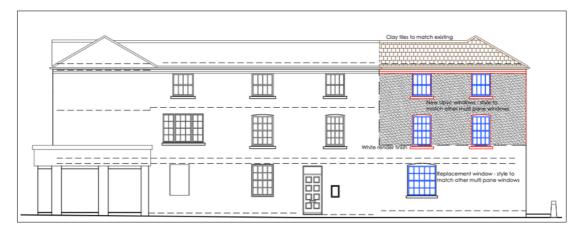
Proposed William Street elevation. Image courtesy of CSB Architects.
